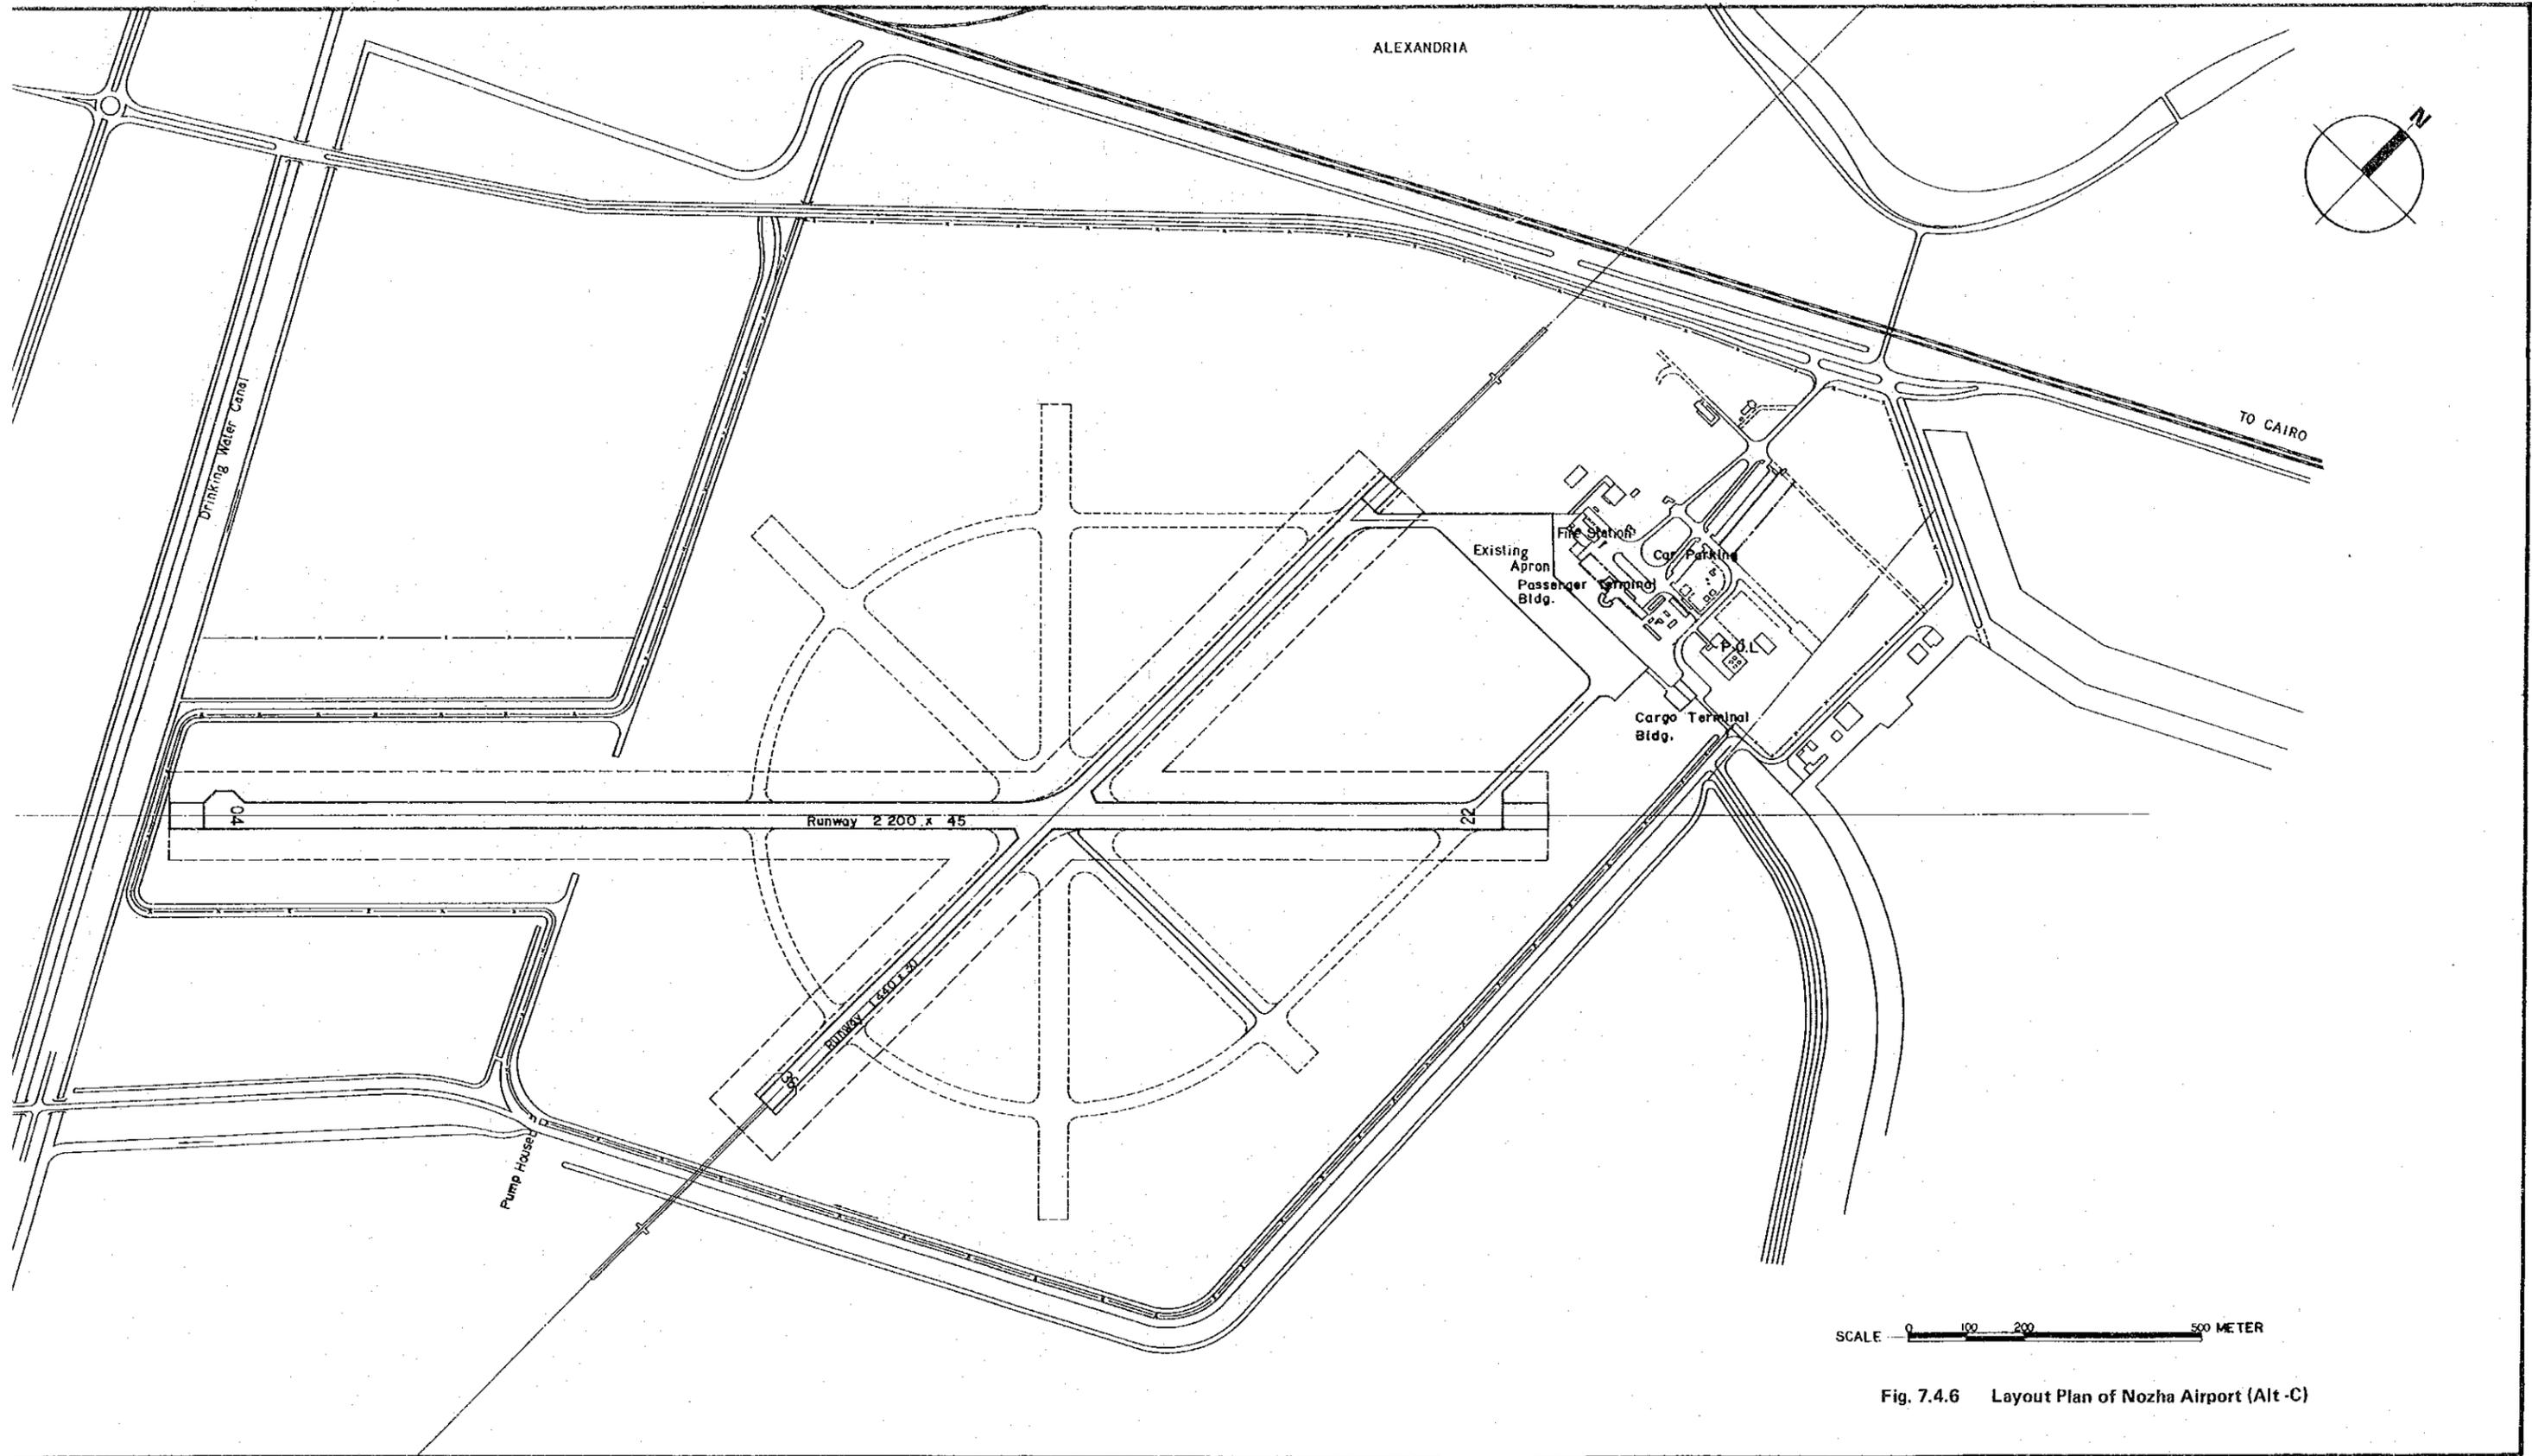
Layout Plan of Nozha Airport (Alt-C)
